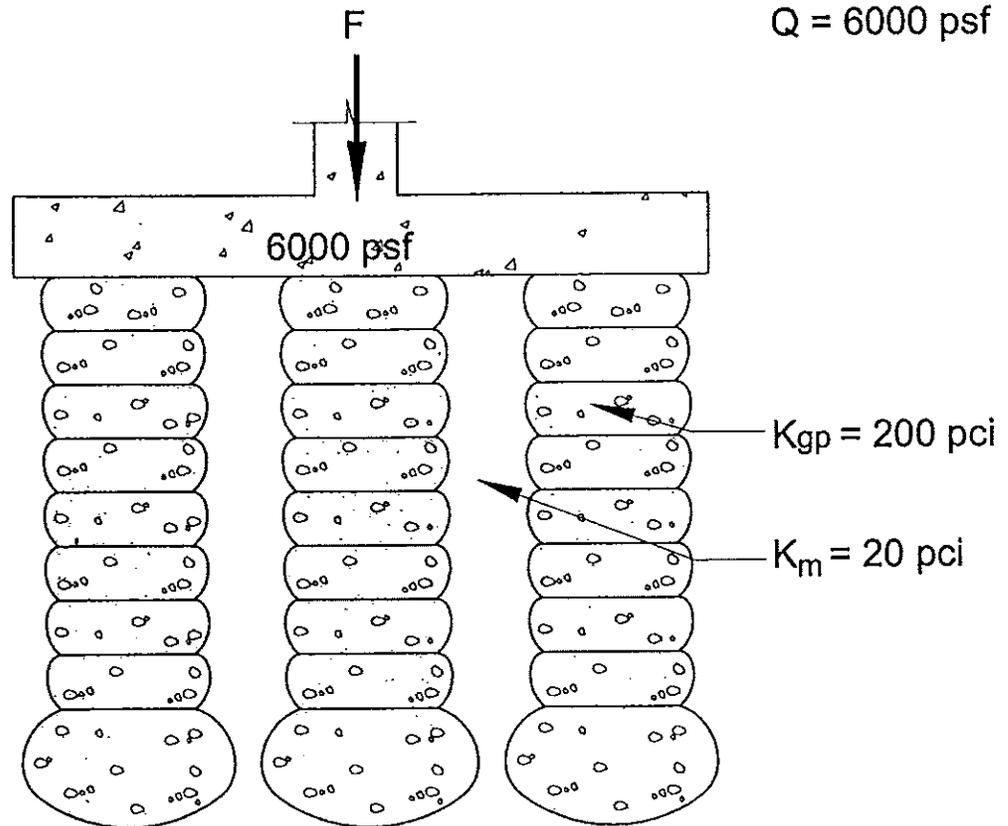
Typical Layout of Geopier Element under an Isolated Column Footing
